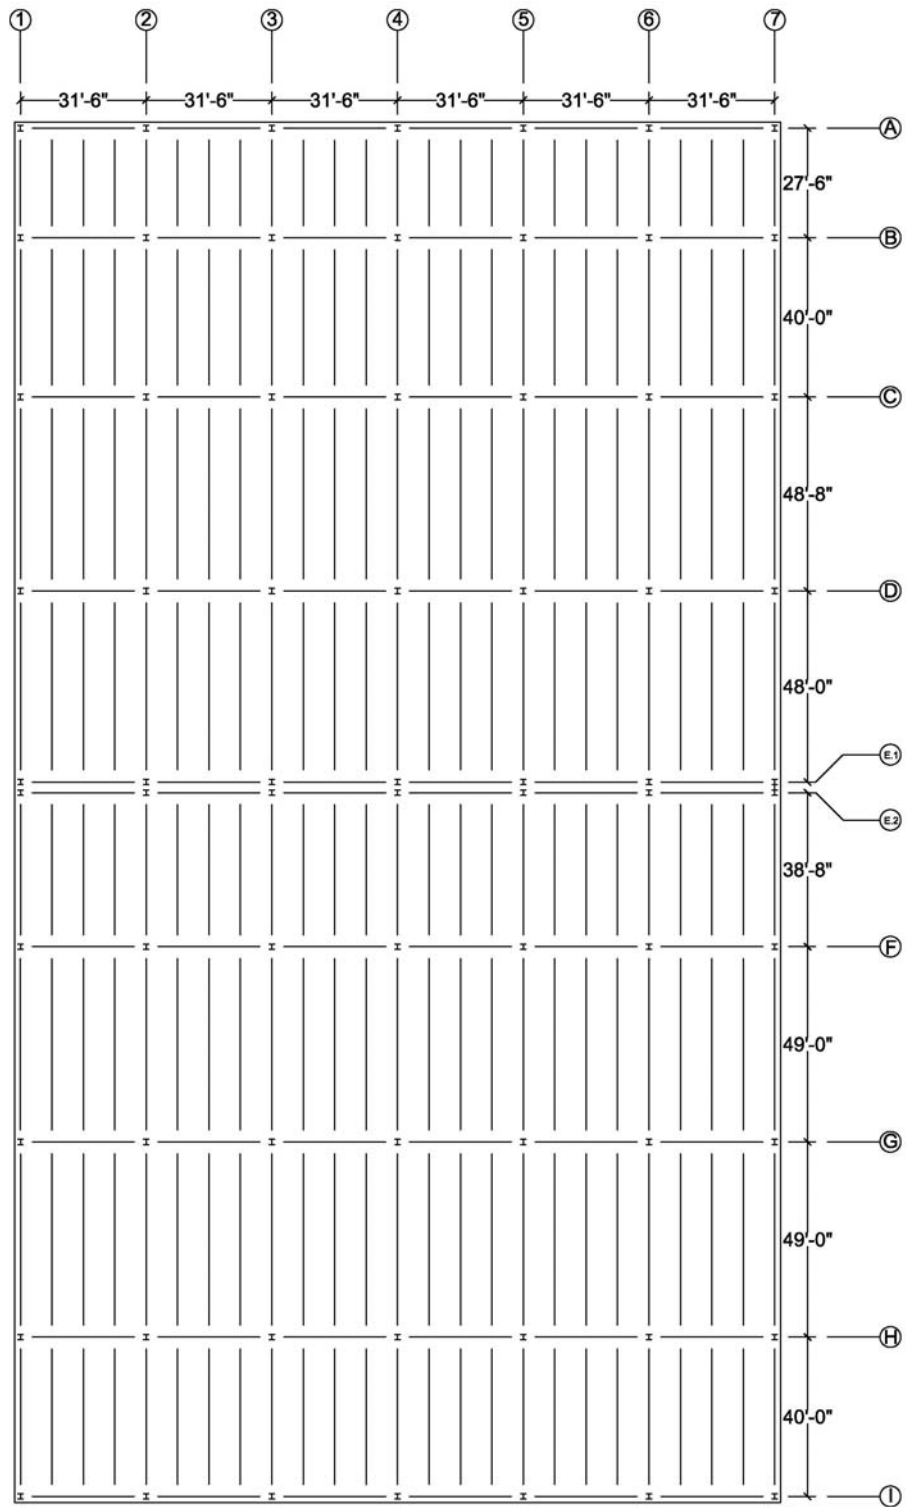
Preliminary Floor Plan for Levels 1st to Roof
